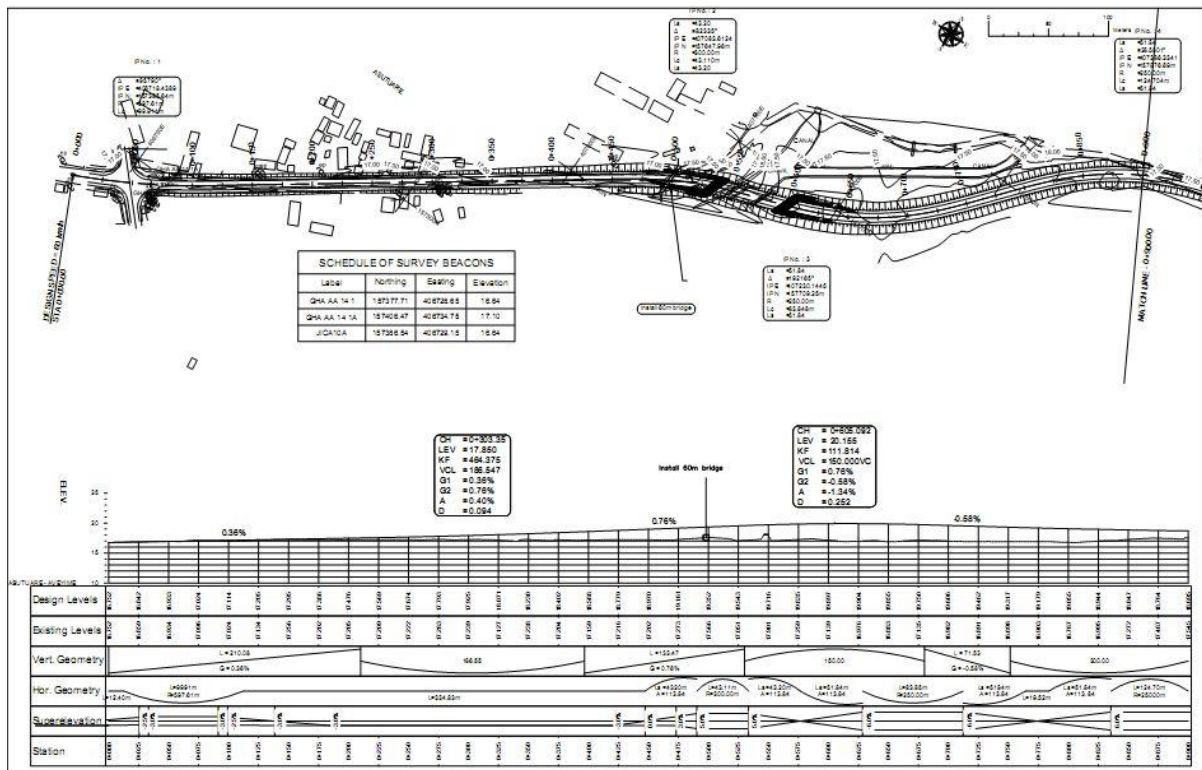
Sample Plan and Profile of Asutuaire – Aveyime Road (Section 2 Project Road)
